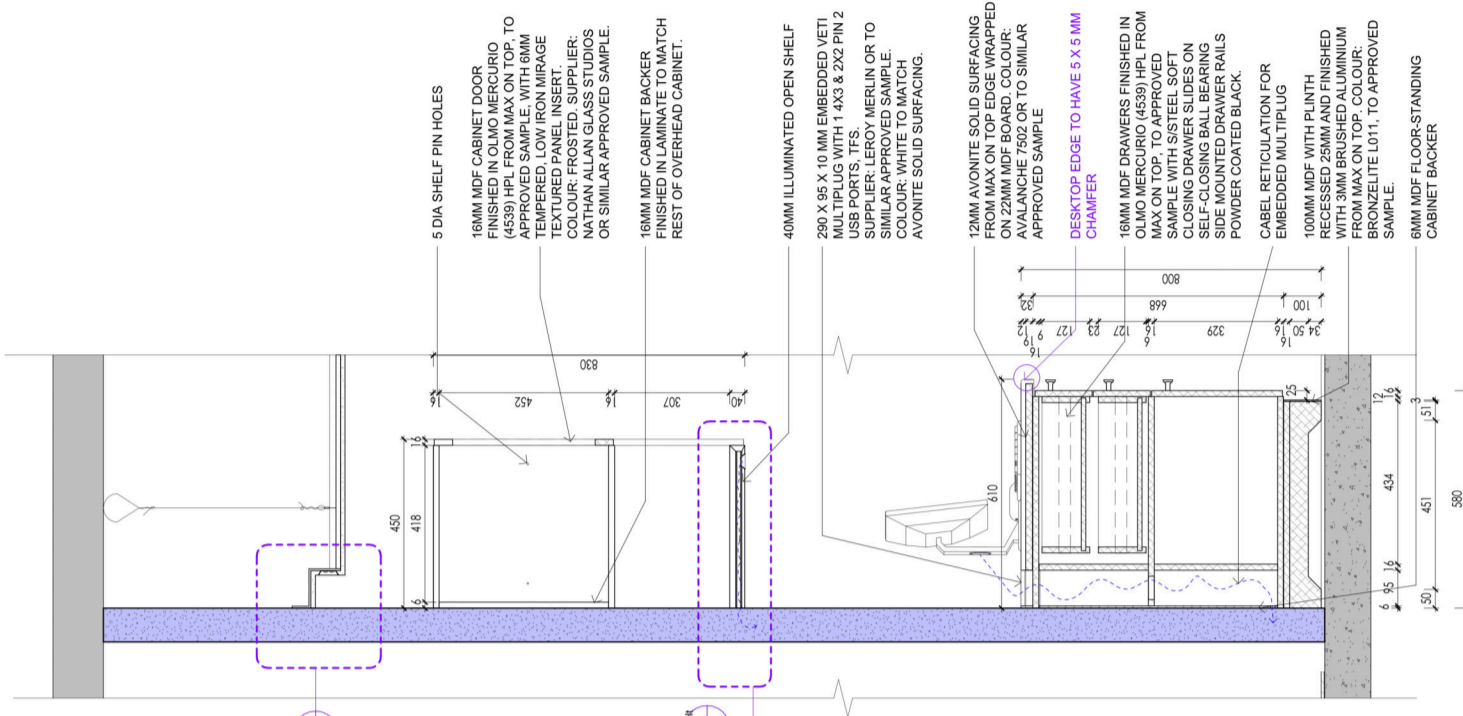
A | 1:10 TYPICAL PLAN OF DESK AND OVERHEAD CABINET
